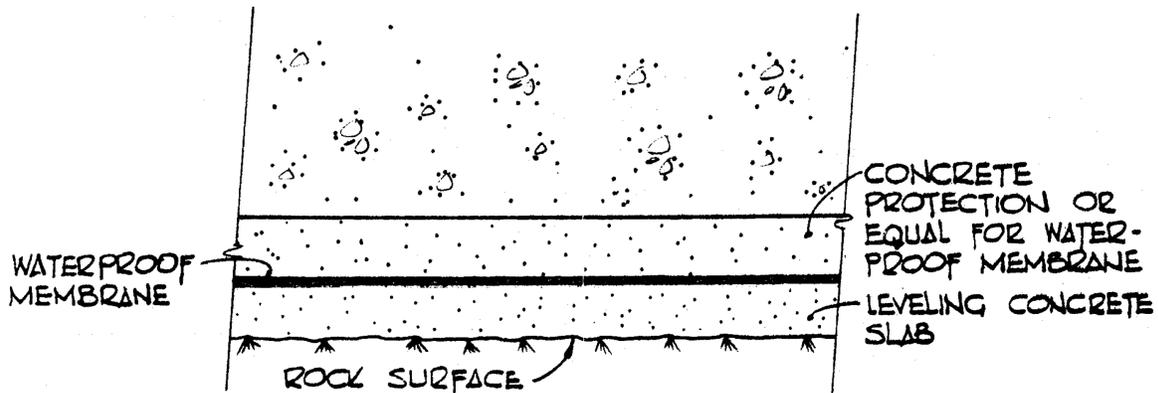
WATERPROOF MEMBRANE DETAILS
